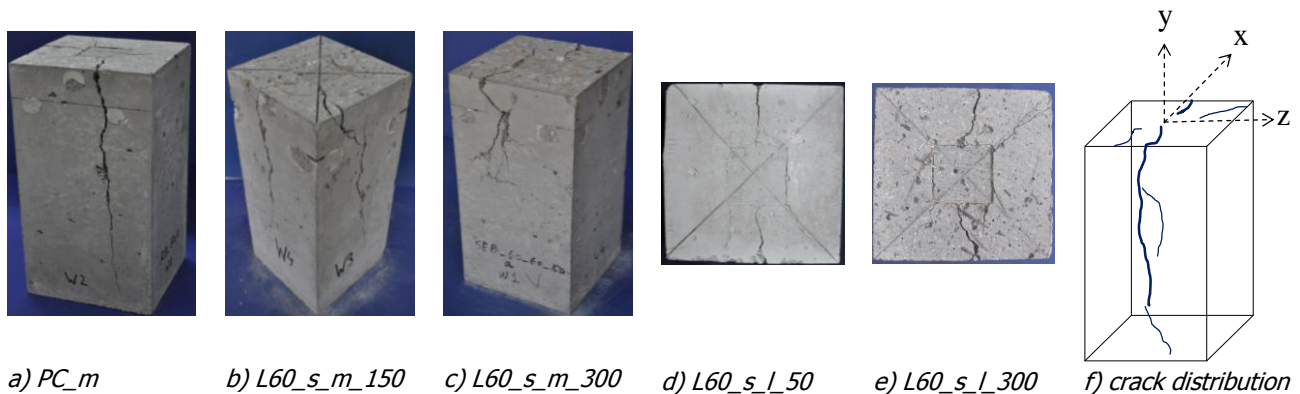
Typical examples of tested specimens produced in standing molds under centric loading
